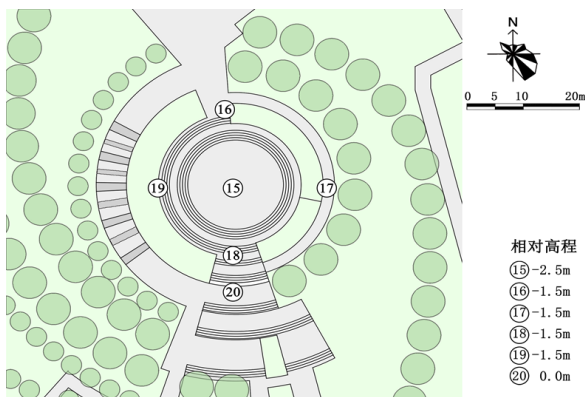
Layout plan of measurement points at Haisu Green Space Square
